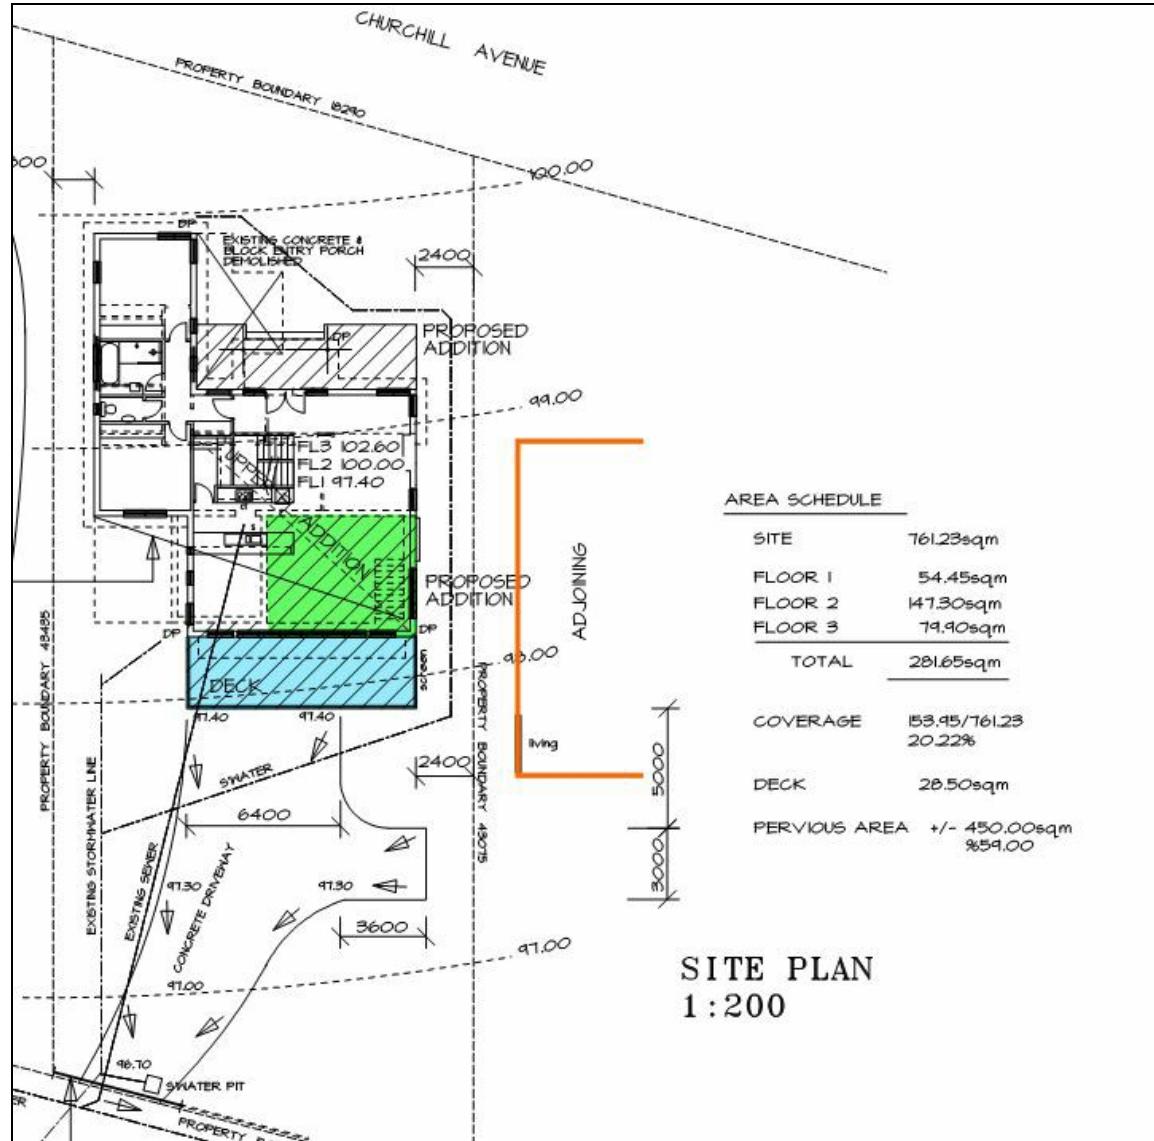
The approved site plan for the approved extension at 213 Churchill Avenue. The green depicts the second floor extension to the house, with the blue being a new deck. The existing dwelling on the subject site is partially outlined in orange.
